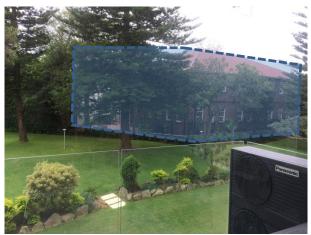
<u>View 3</u> - View impact from the living room of Unit 2C towards the northwest to the proposed new building
